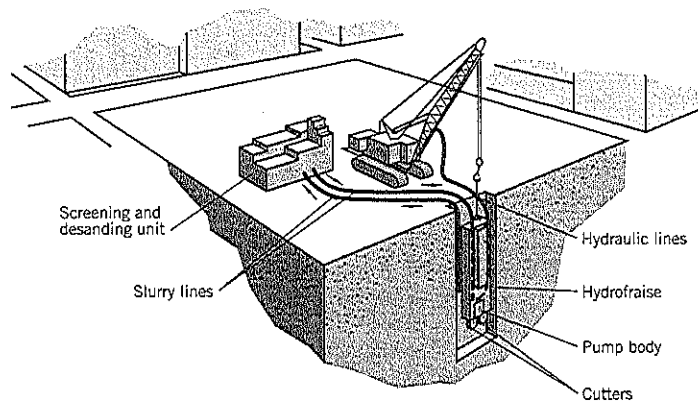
Hydrofraise excavating a slurry trench wall.
